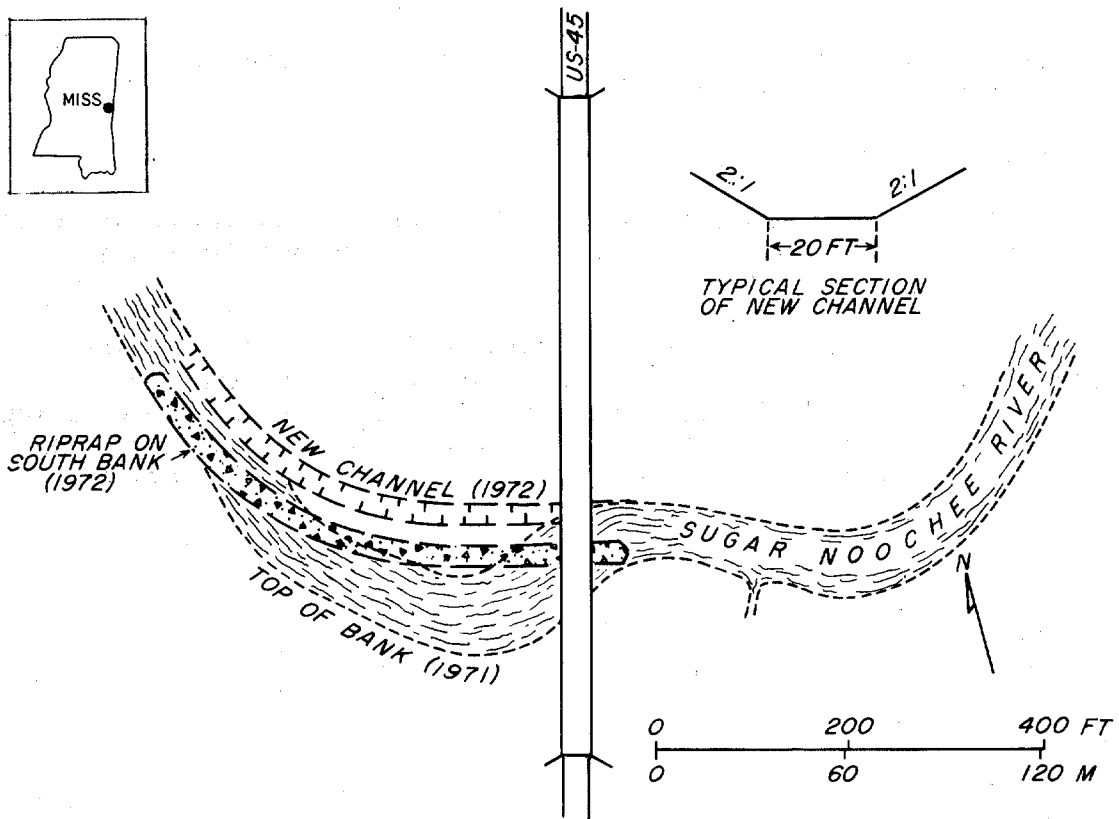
Plan sketch showing countermeasures at US-45 crossing.
